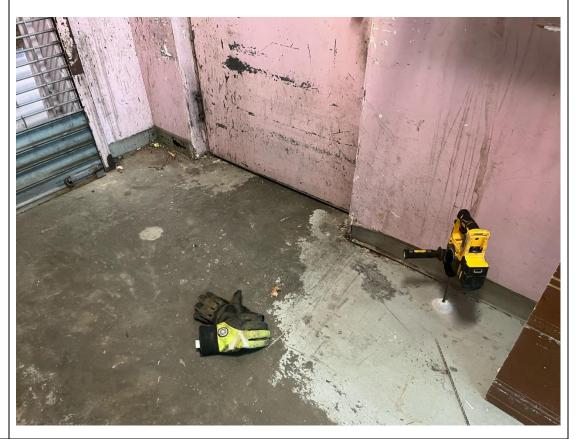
View of Pennington drilling to install a vacuum gauge and sample port on VEP-2 in Carvel, facing northwest.
